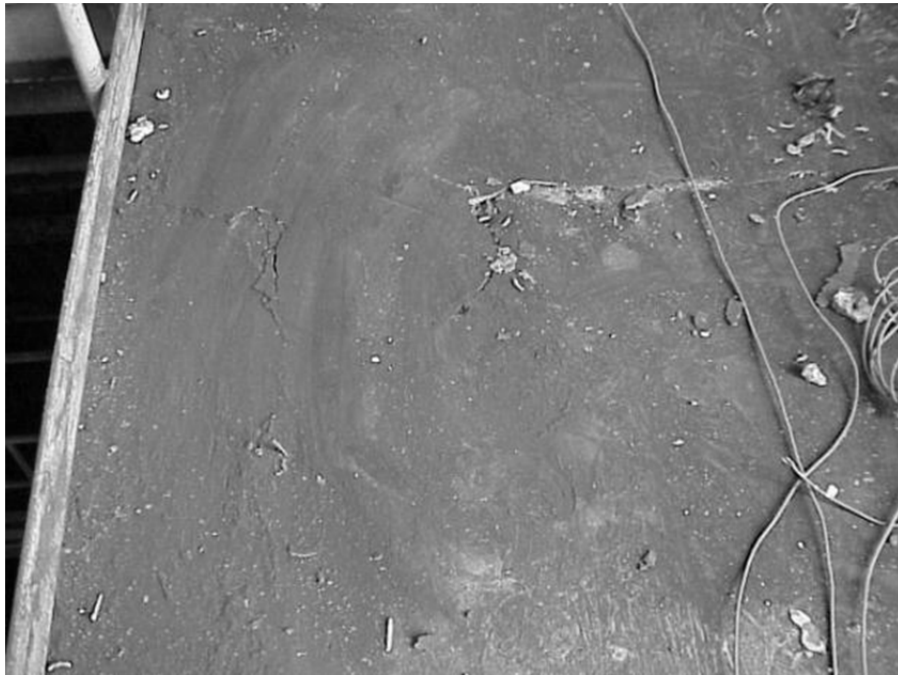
Floor above blast chamber A2 showing area of spalled concrete.
